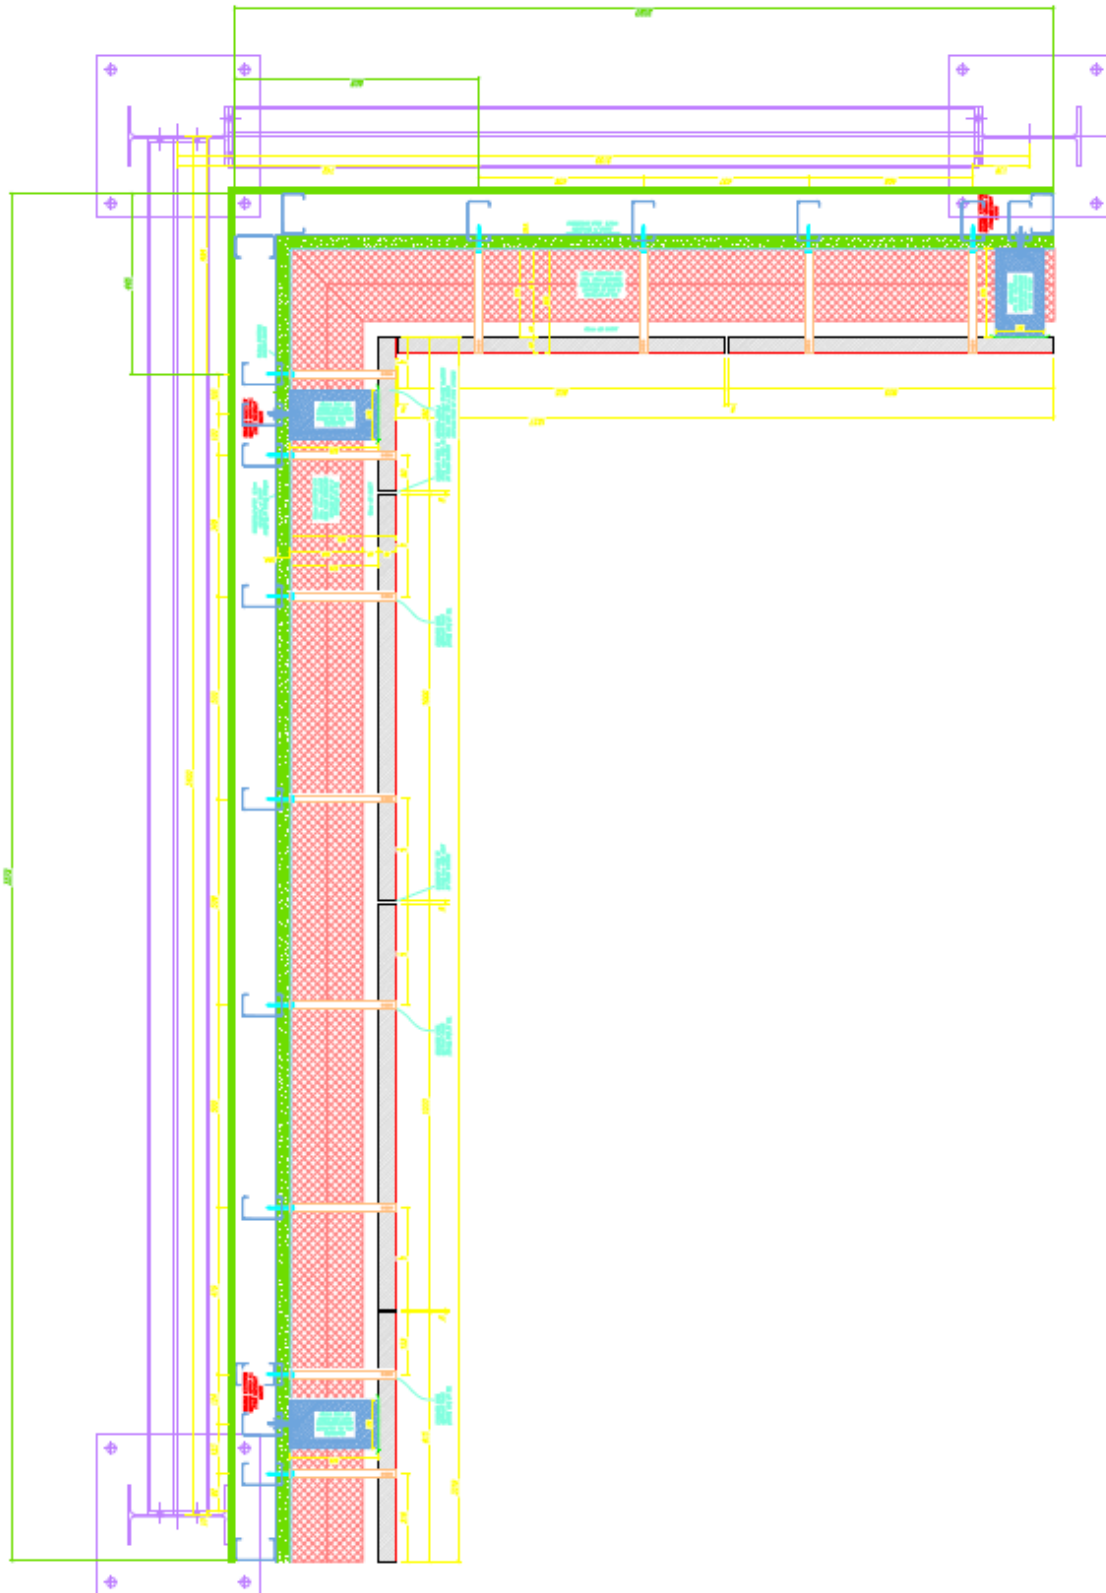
Sketch of façade system detail. Plan view of tested facade.
